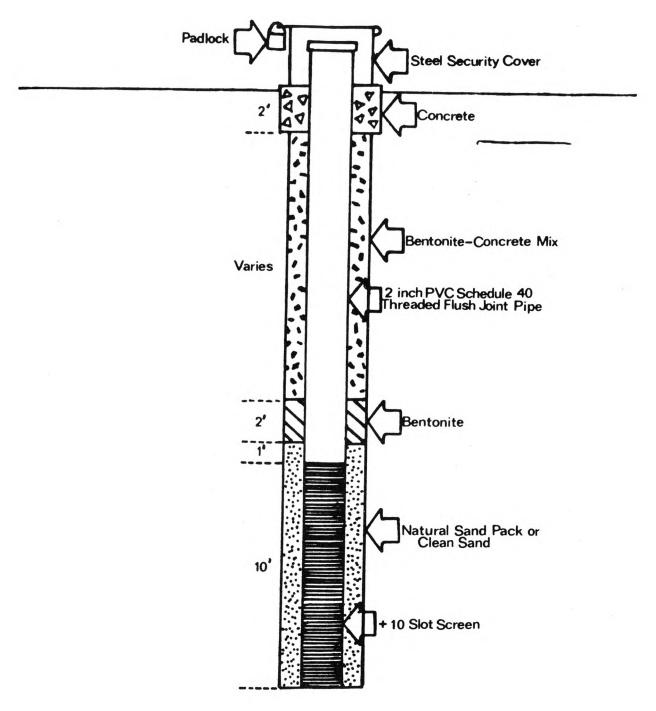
Typical Design of Existing Groundwater Monitoring Wells (Rudy, 1984)
